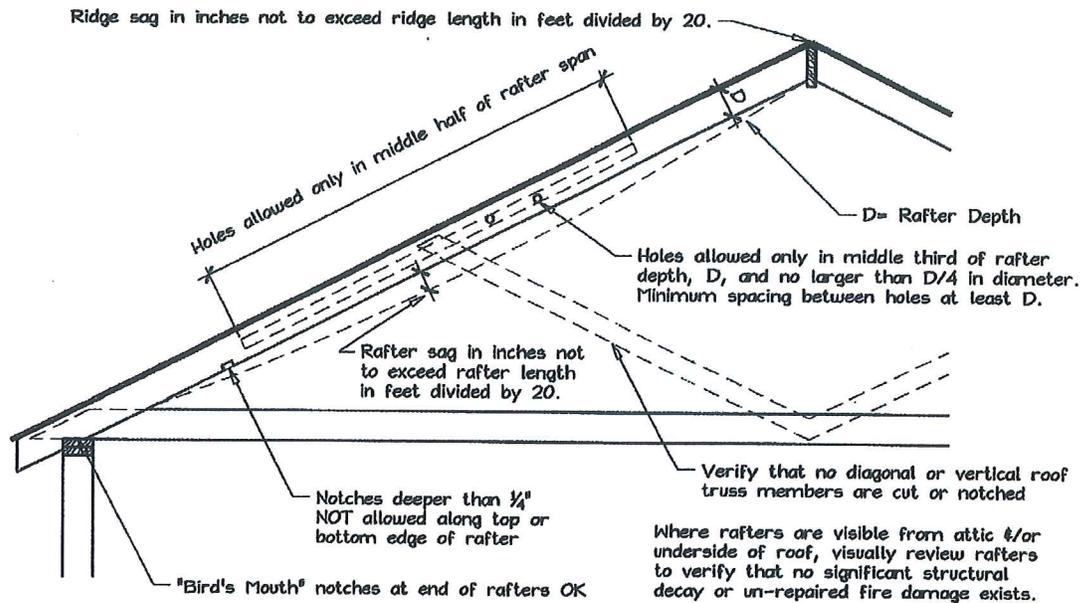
Roof Visual Structural Review (Contractor's Site Audit) of Existing Conditions.
